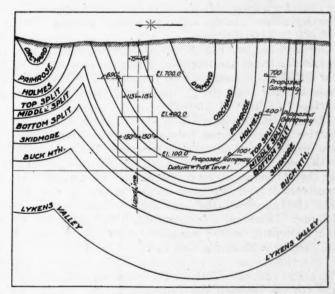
CROSS-SECTION SHOWING PILLAR ESTABLISHED LENGTHWISE WITH THE STRIKE
